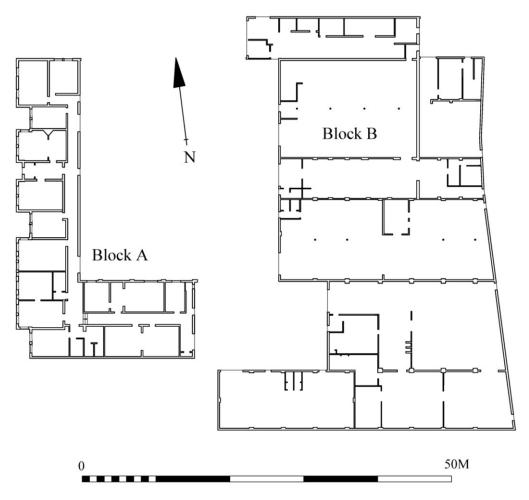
Plan of Workspace 17 buildings Modified from Leicestershire County Council plans
